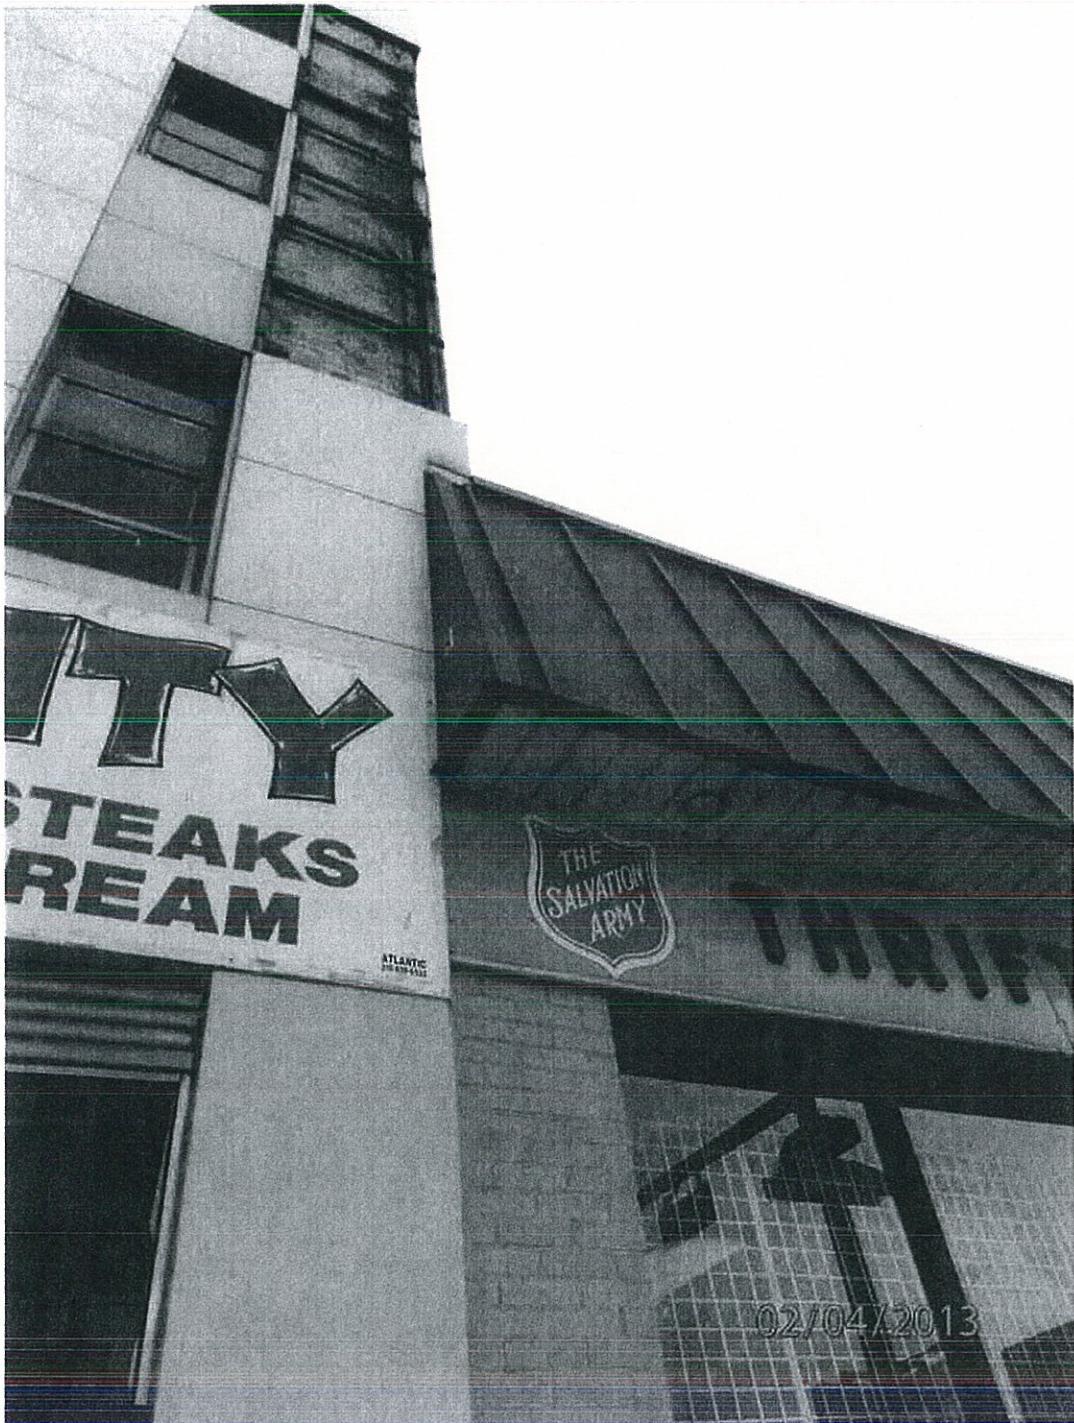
Façade Detail 2140 Market Street, Philadelphia, PA
